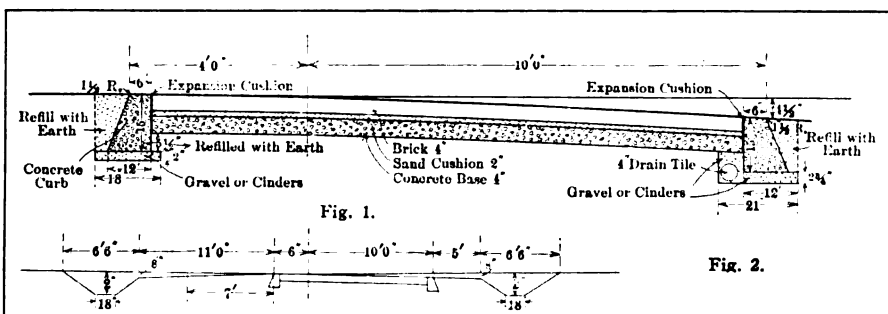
Section of a brick-paved street showing the details of construction. Fig. 2—Dimensional information related to Fig. 1
